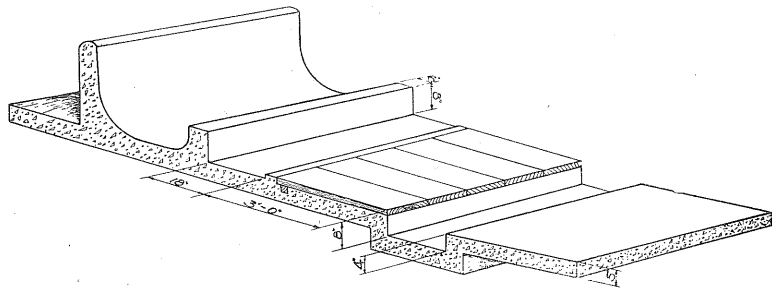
A WOOD OVERLAY FOR THE STALL FLOOR
